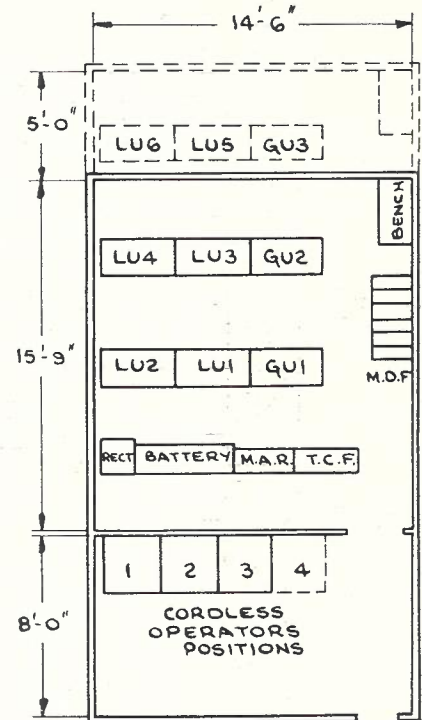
Typical Equipment Layout for 400-600 Line P.A.B.X.
